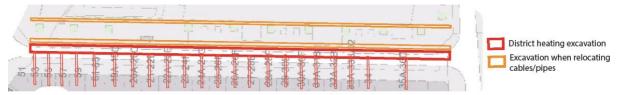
Top view of the Bospolderplein-street: excavation in situation 2
